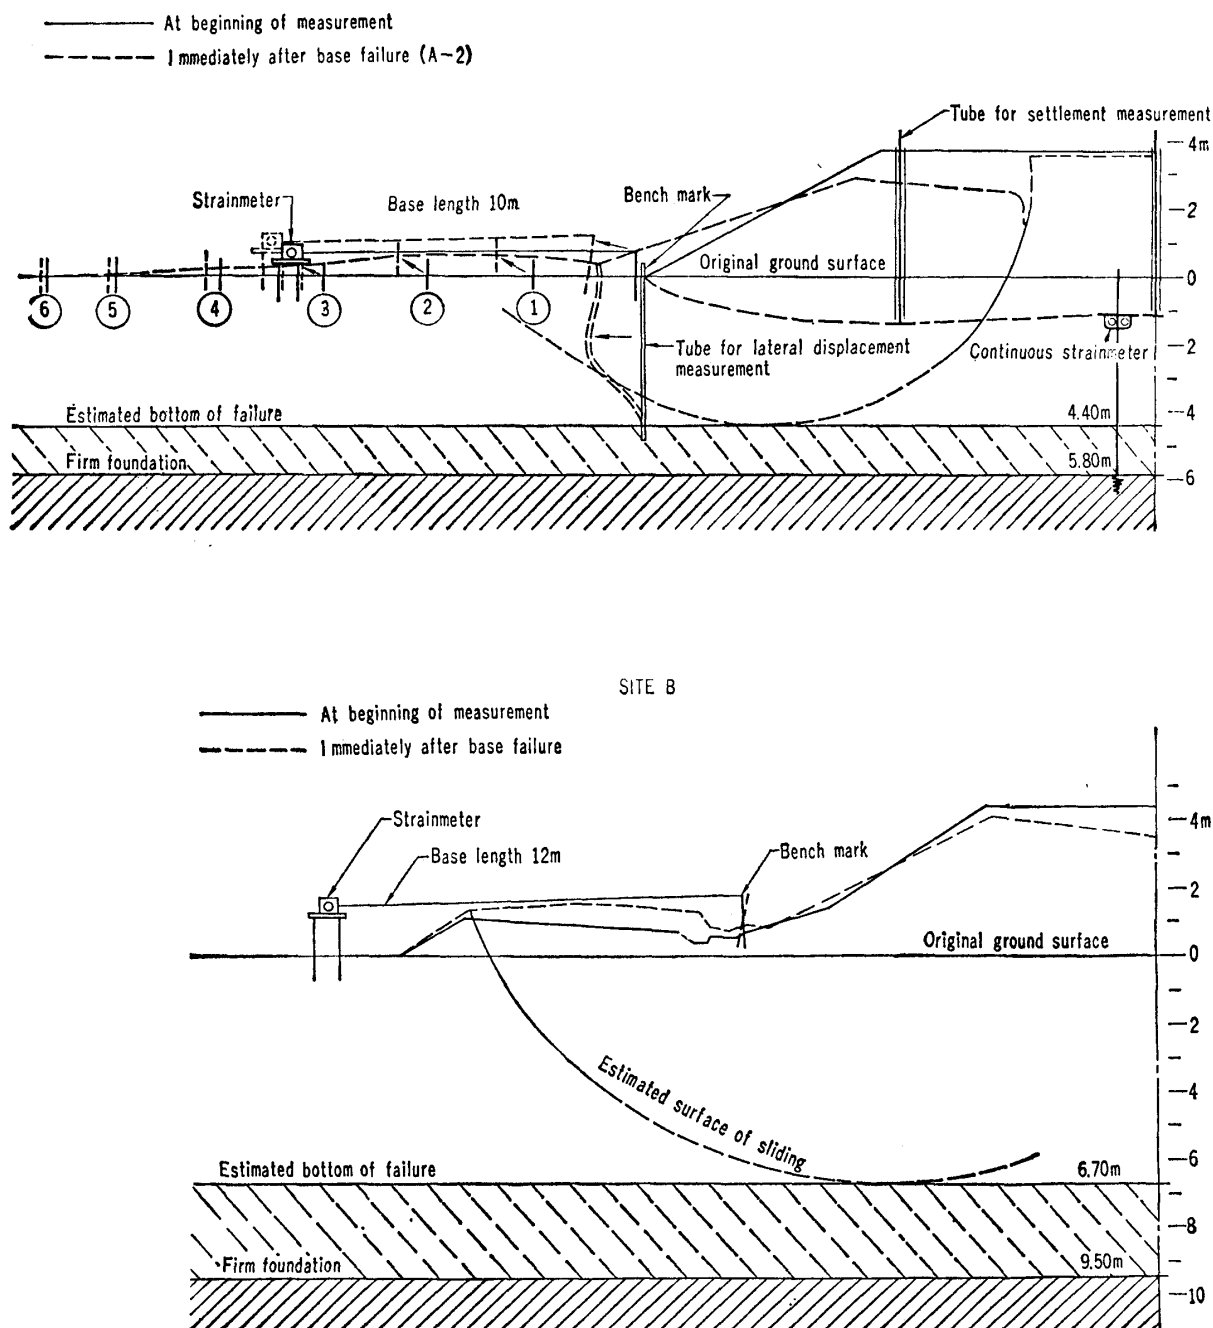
Arrangement of Measuring Apparatus in Cross-Section
